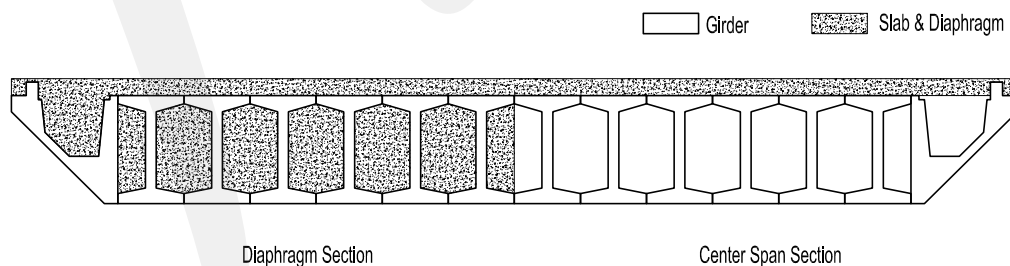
Cross-section view of the bridge illustrating both with and without diaphragms.
